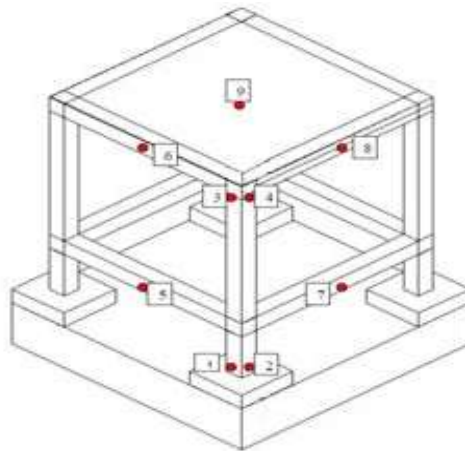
(c) Reinforced Cement Concrete (RCC) model with isolated footing with accelerometer locations
